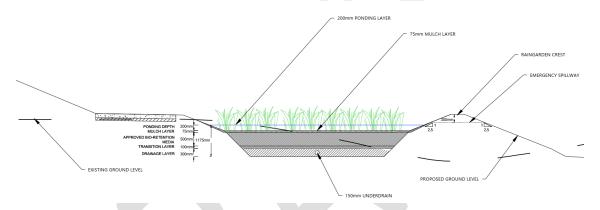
Raingarden 2-1 Detail, DWG No. P24-447-01-3605-DR
